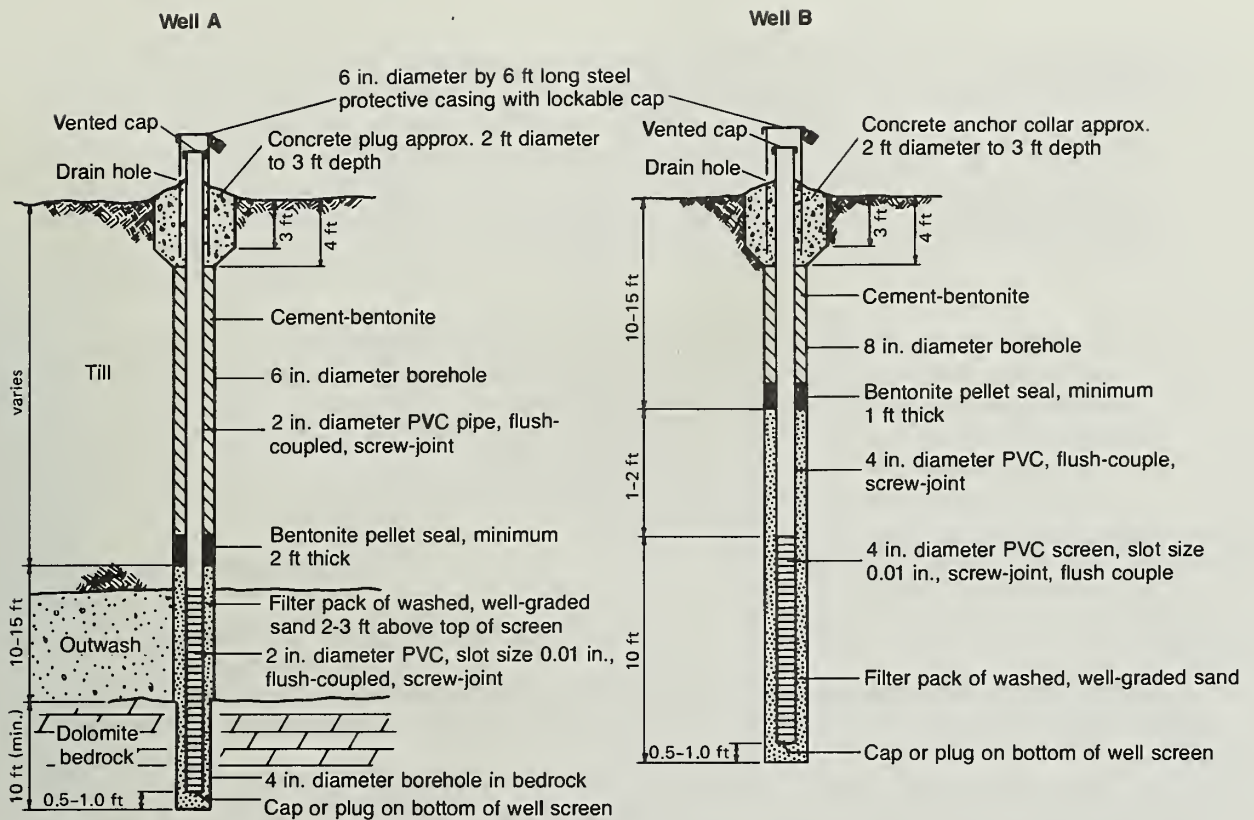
Typical construction of bedrock (A) and till (B) wells at ESL site.
